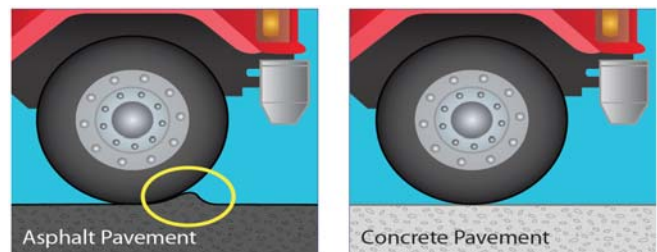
Exaggerated depiction of a truck tire rolling on asphalt pavement (left) and concrete pavement (right)
